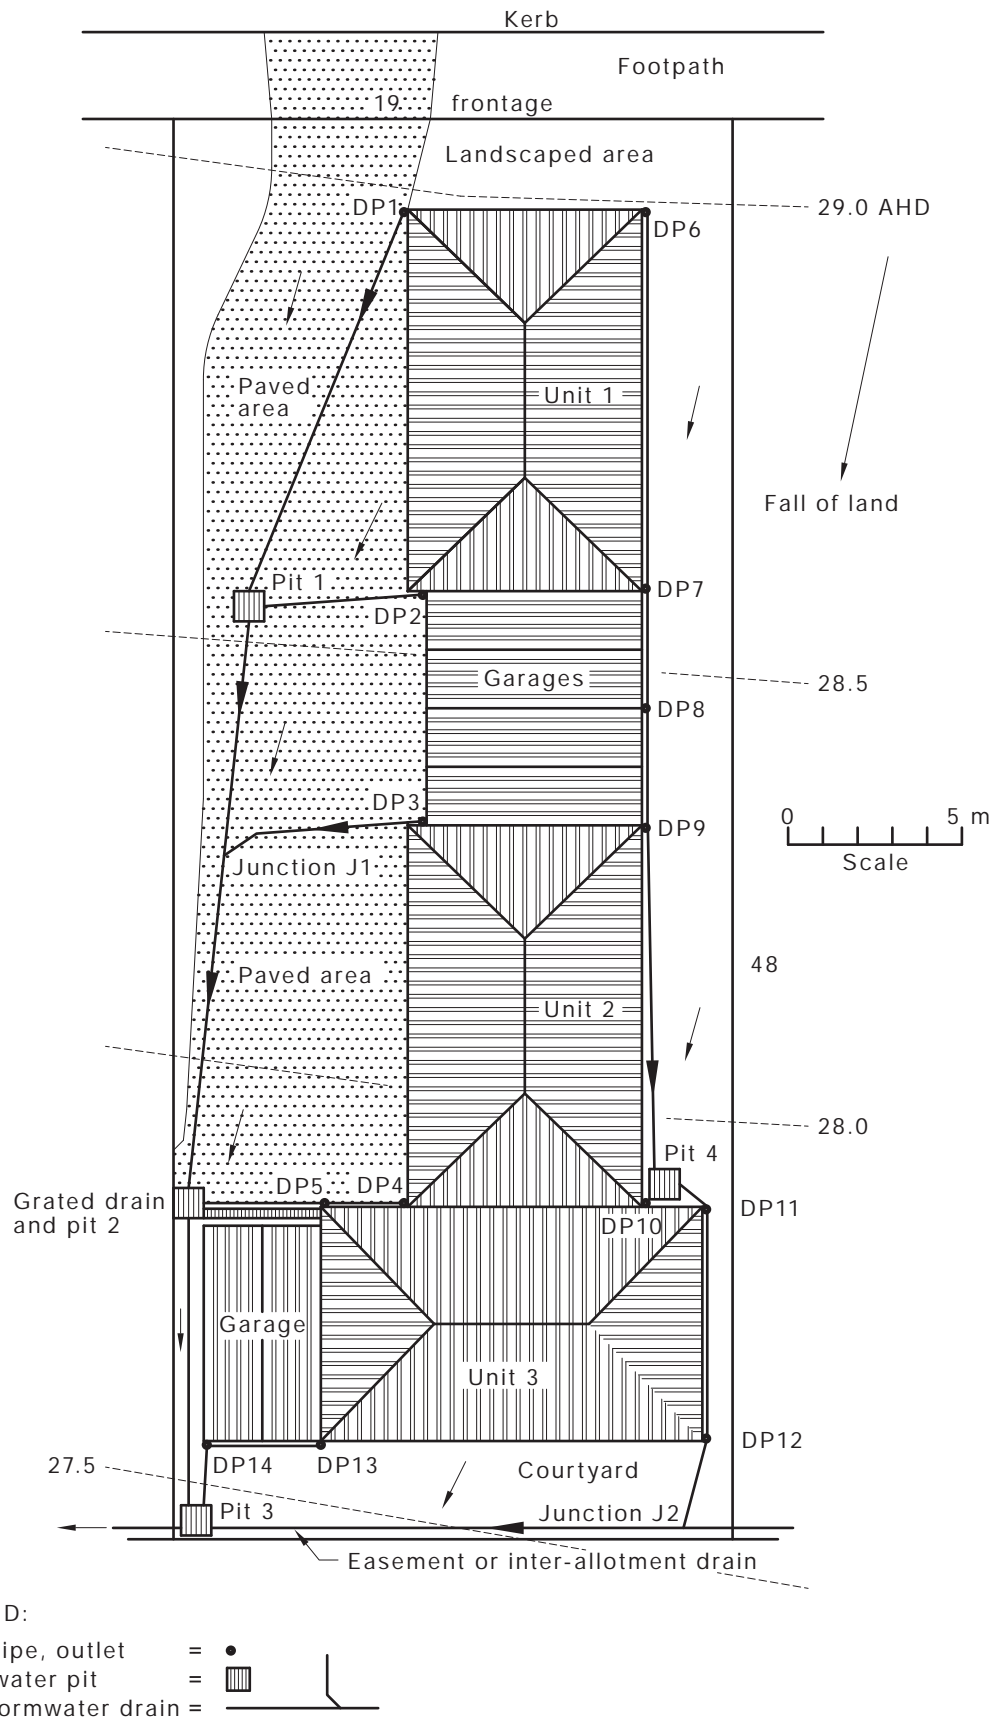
STORMWATER DRAINAGE INSTALLATION PLAN—EXAMPLE 2
